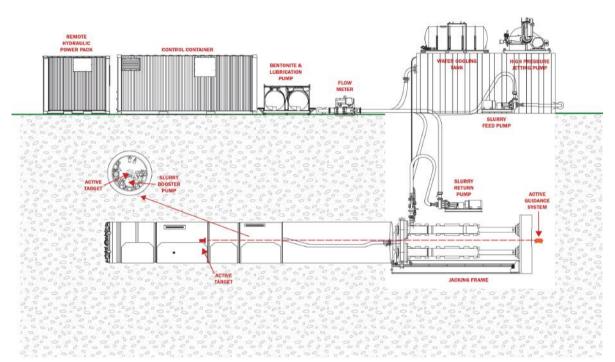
General arrangement of microtunneling jacking shaft setup
